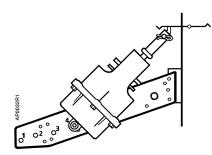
No. 6 Actuator Frame Mounting, Normally Open Damper.
